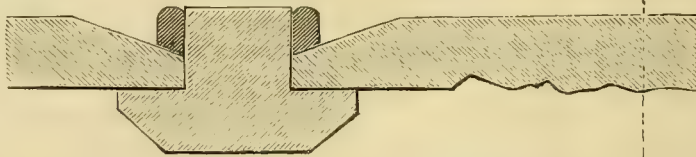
SECTION THROUGH CARVED PANEL OF DOOR.
